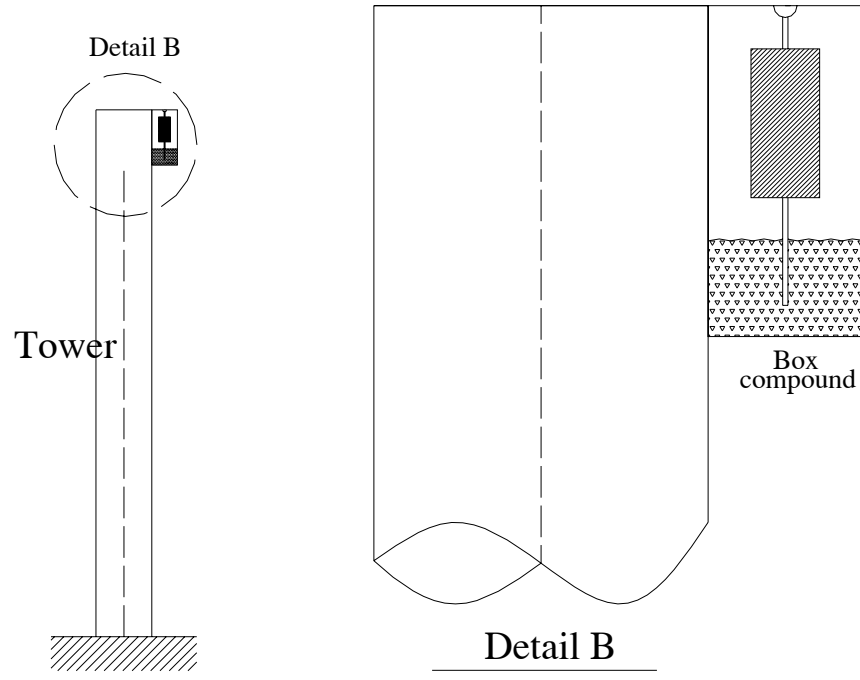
The tower is damped by using a pendulum mass with a bottom rod in a damping material
